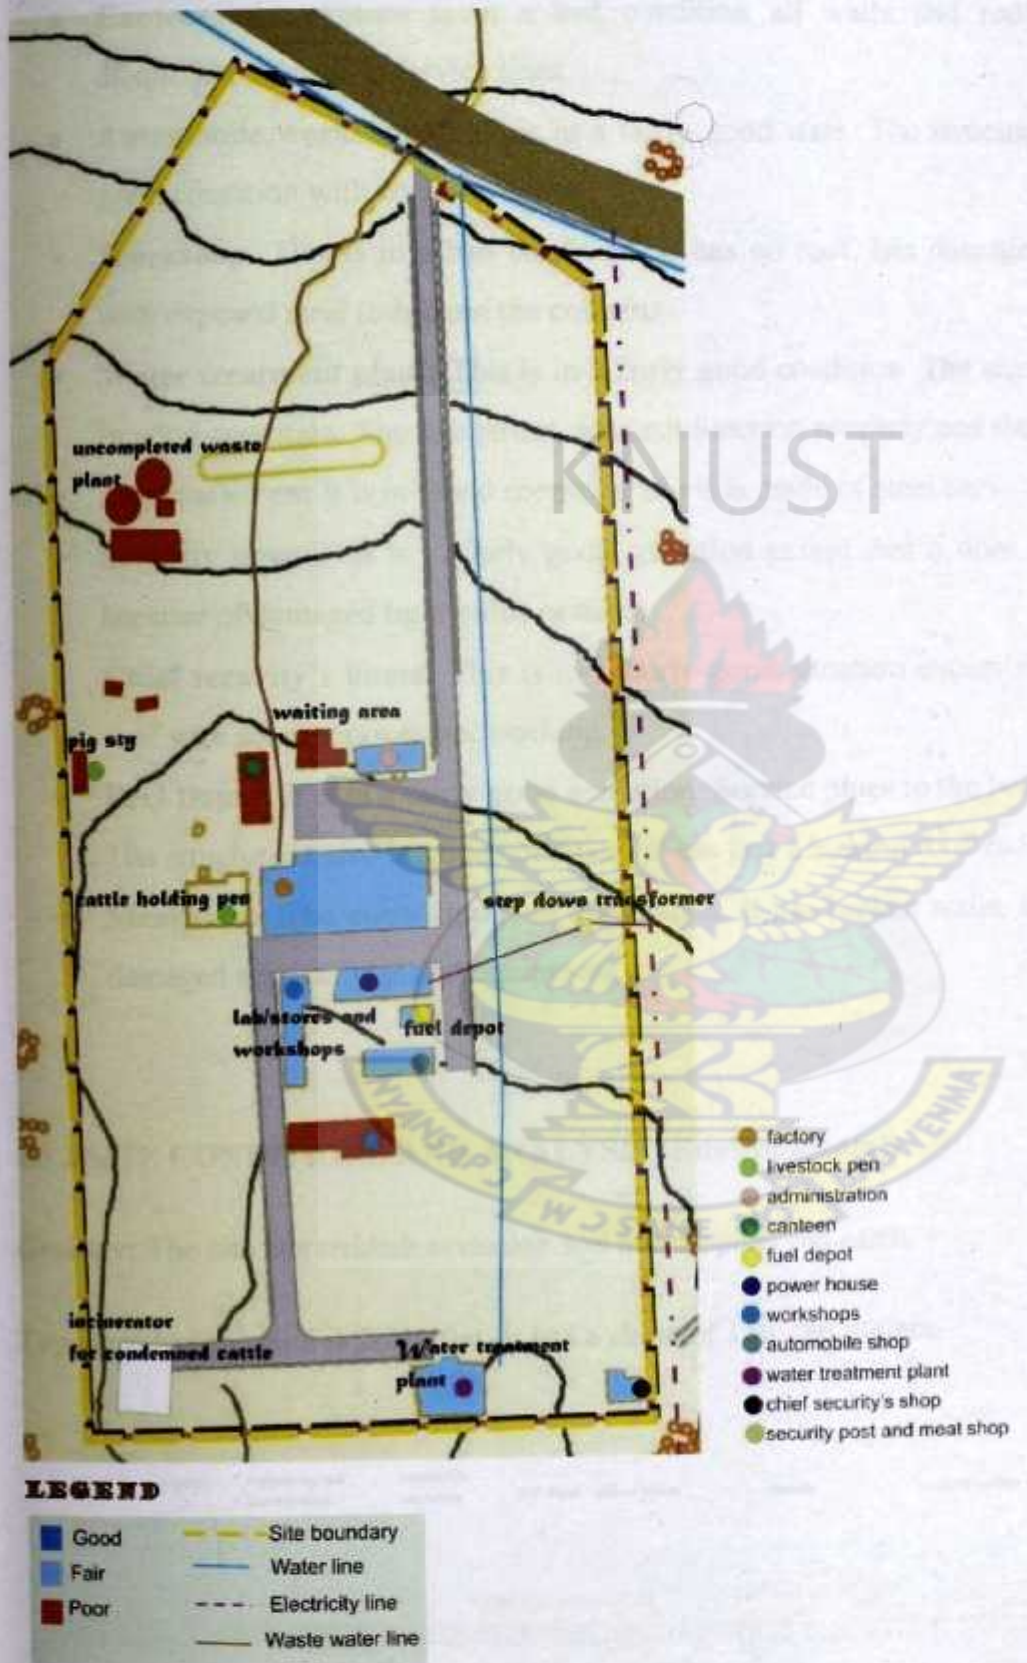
Site plan of the Bolgatanga meat factory showing the existing building conditions
